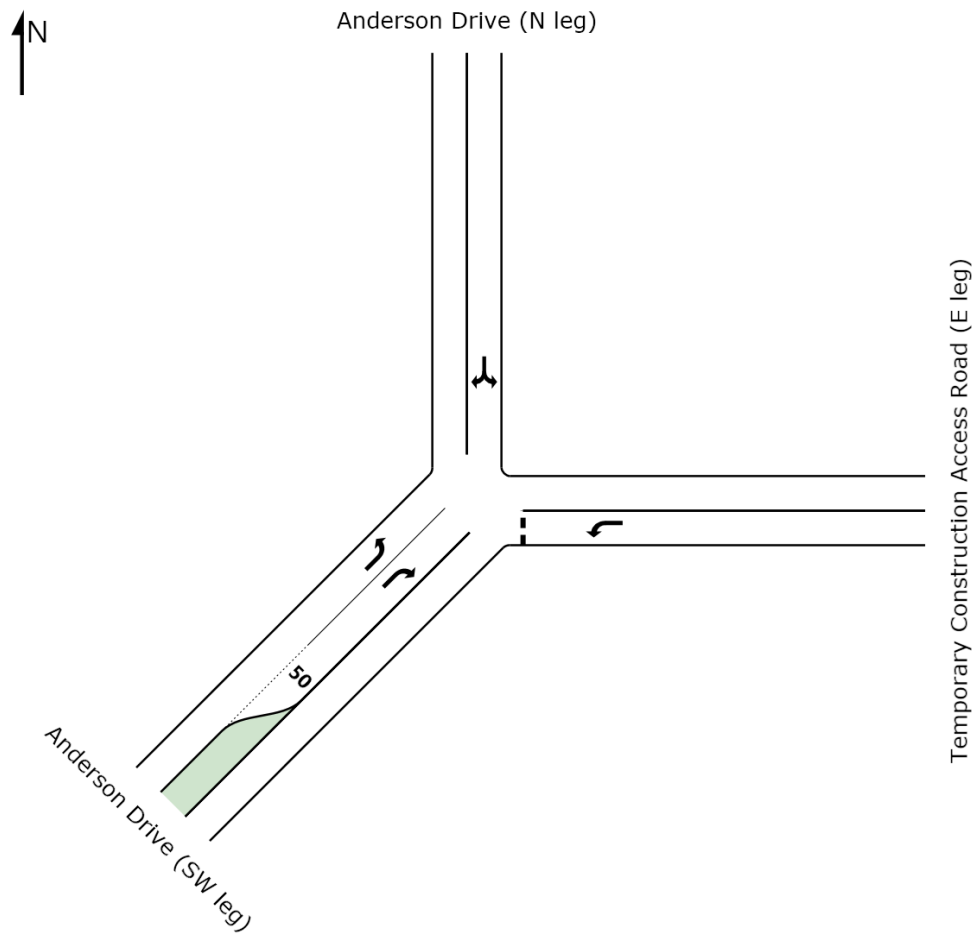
Modelled proposed layout of Anderson Drive intersection with the temporary construction access road
